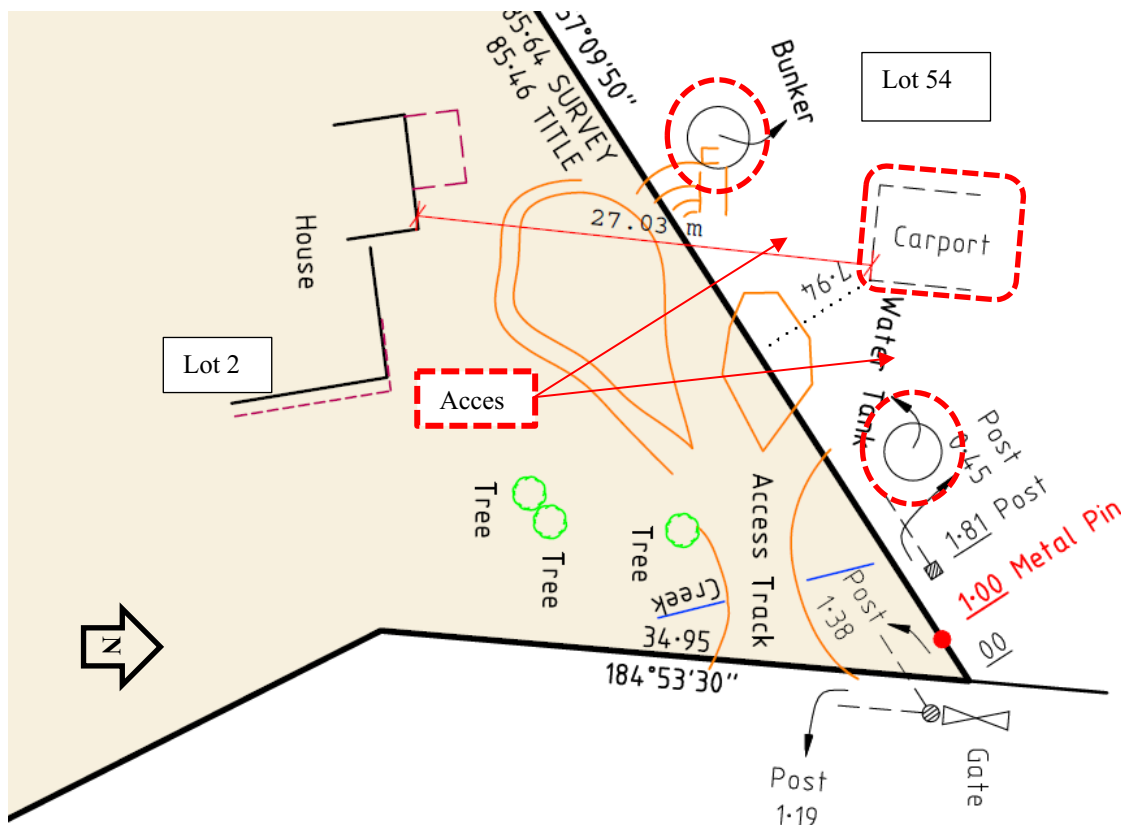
Subject Structures Highlighted by Red Dashed Lines
